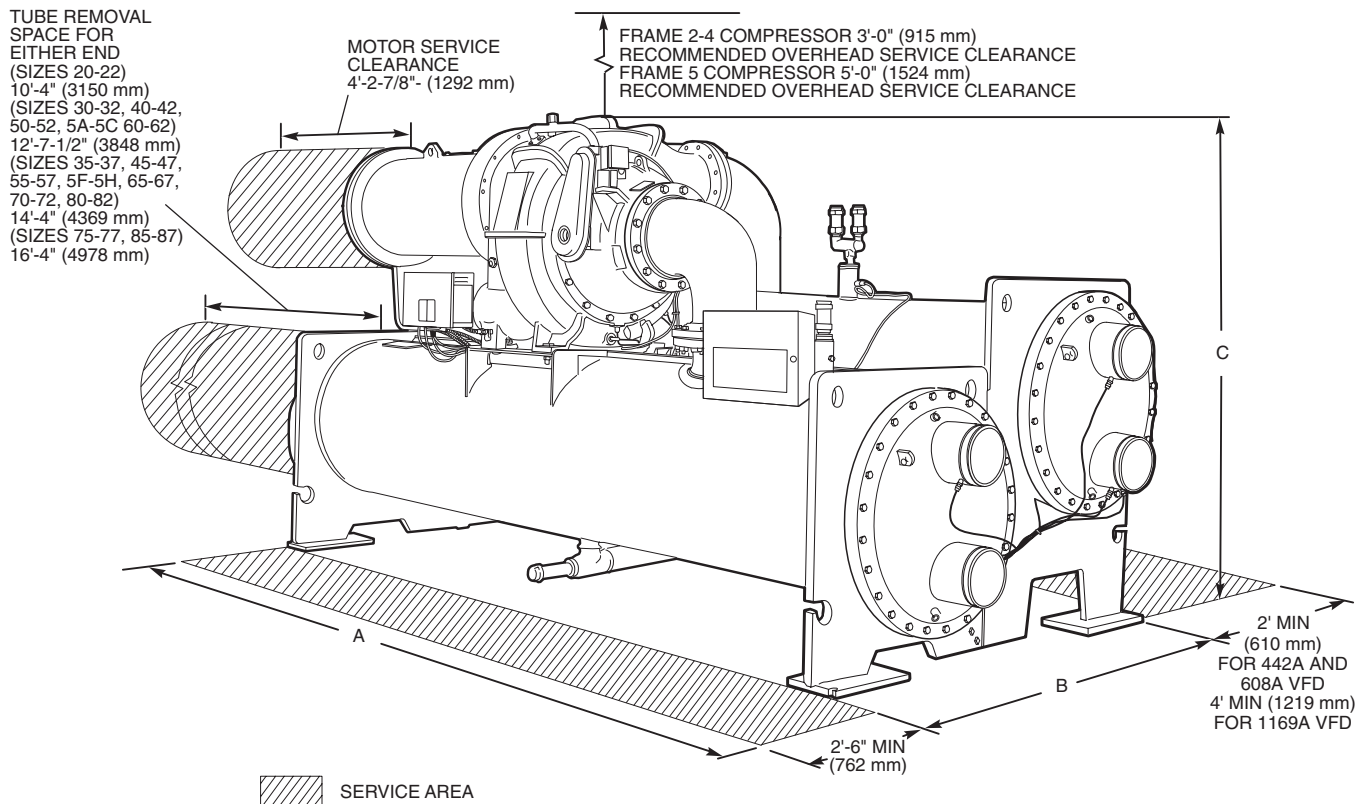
19XRV Dimensions (Refer to Tables 1 Through 3)
